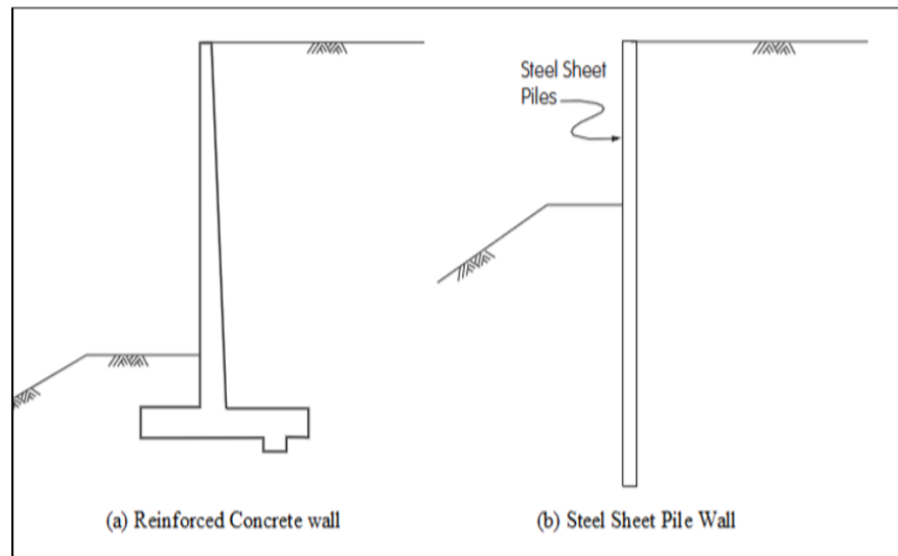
Retaining walls; (a) rigid wall, (b) flexible wall(Ramadan, 2013)
